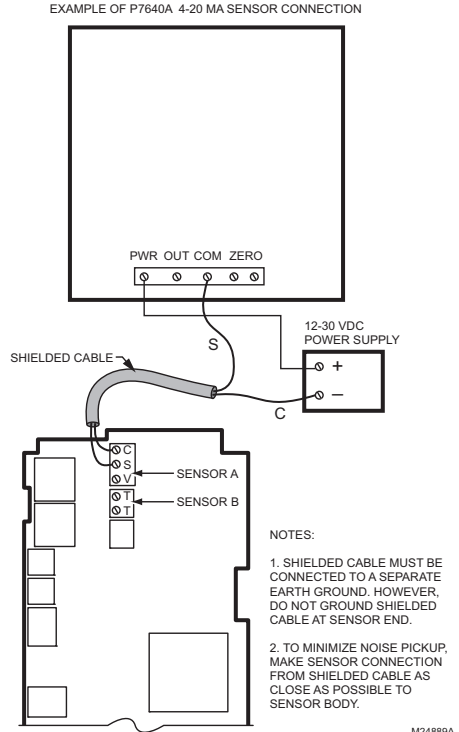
Sensor Wiring — 2-wire 4-20mA sensor input to T775 controller using a separate (Vdc only) transformer.
